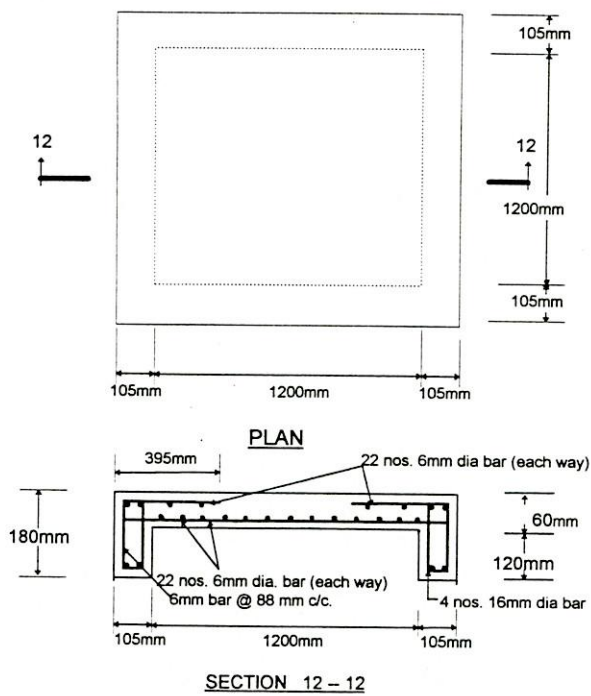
(a) Plan (b) Section and reinforcement details of SLAB 12
